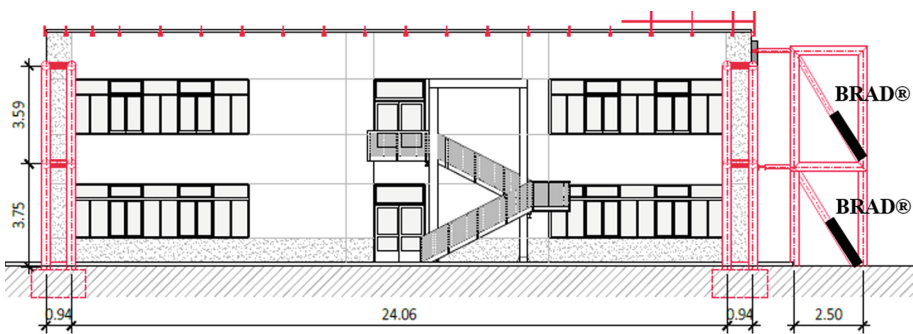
Lateral view of the building with external bracings in red. Dimensions in m.
